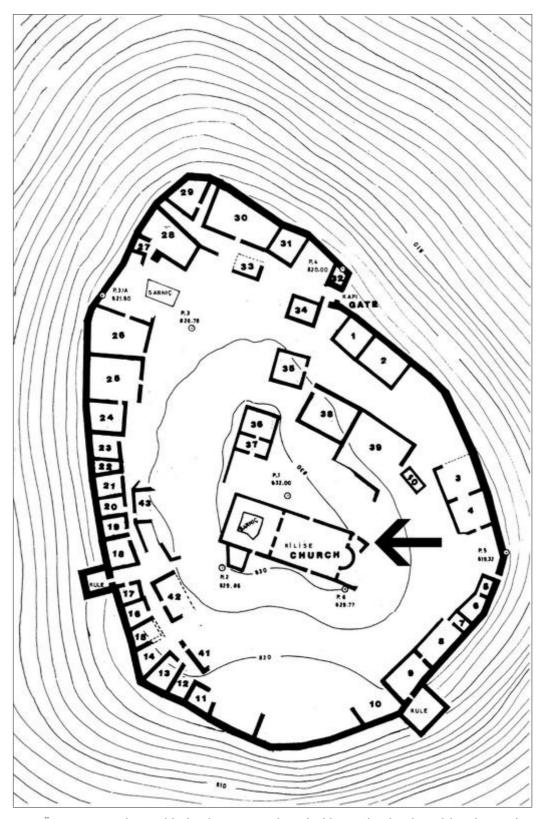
Ören Tepe site plan modified with arrow to indicate building under church (Aydal et al. 1997, fig. 8).
